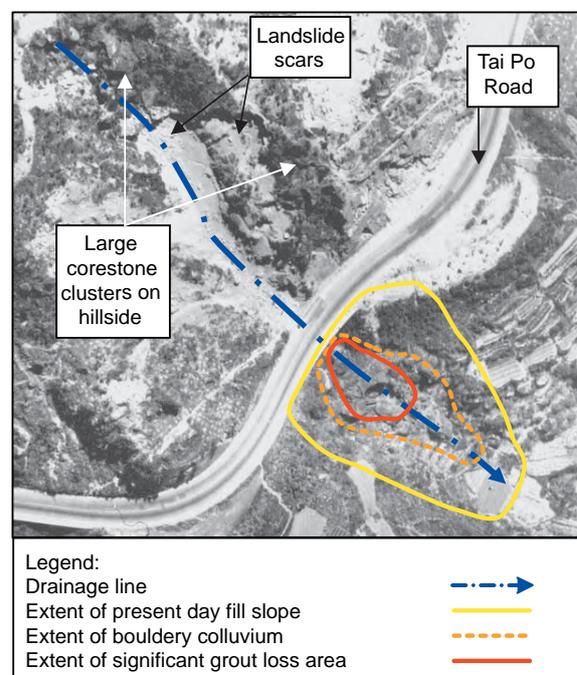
1949 aerial photograph showing the location of the fill slope below Tai Po Road prior to construction
